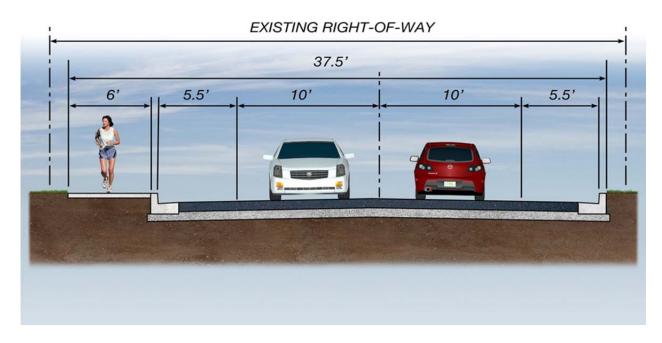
Proposed Roadway Section West of Proposed Movable Bridge
